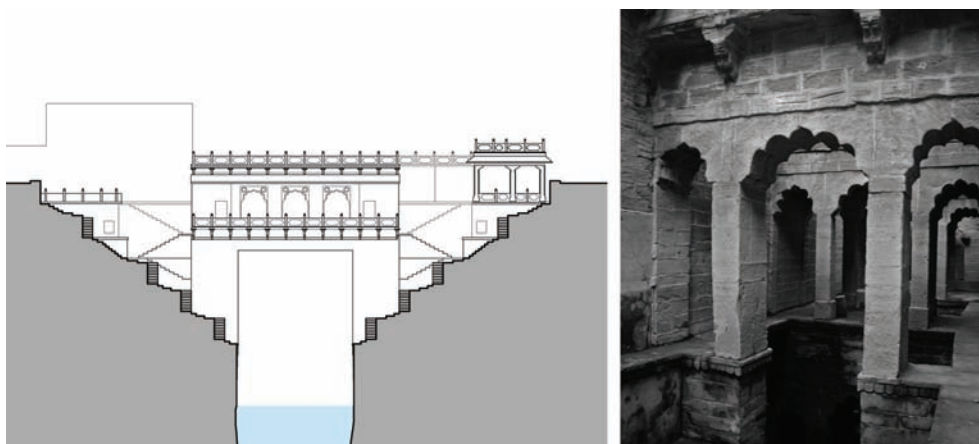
(on the left) Tunvarji ka jhalara, the cross section showing the criss-crossing flights of steps for access to the water; (on the right) Satyanarayan Bavdi a small compact step well in the heart of the dense urban fabric
